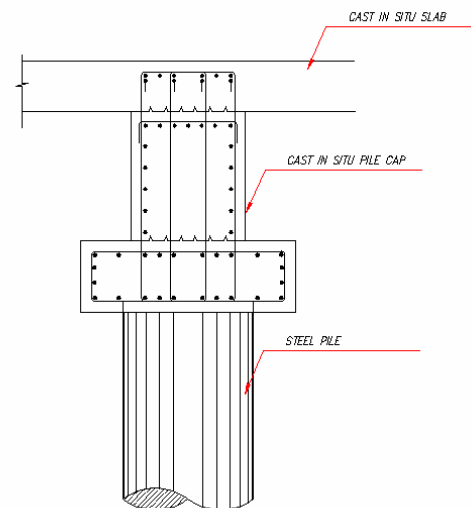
Cast-in-situ reinforced concrete pile-cap
